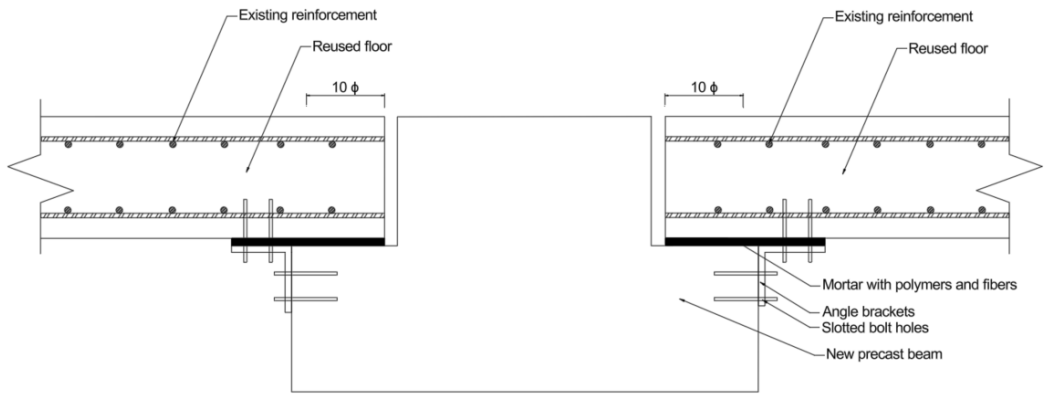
Design proposal of the beam-slab connection with stability assurance by angle brackets
